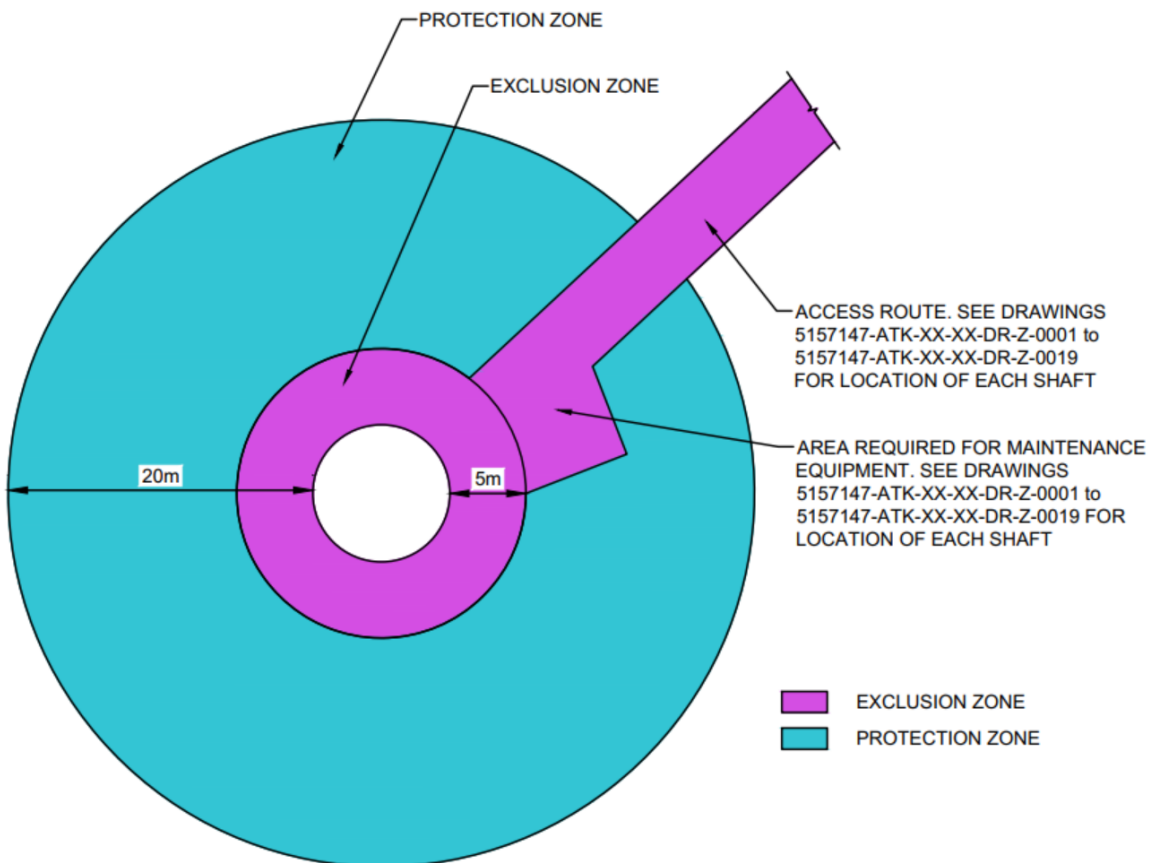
Plan of Exclusion and Protection Zones for Belfast Stormwater Tunnel Shafts
